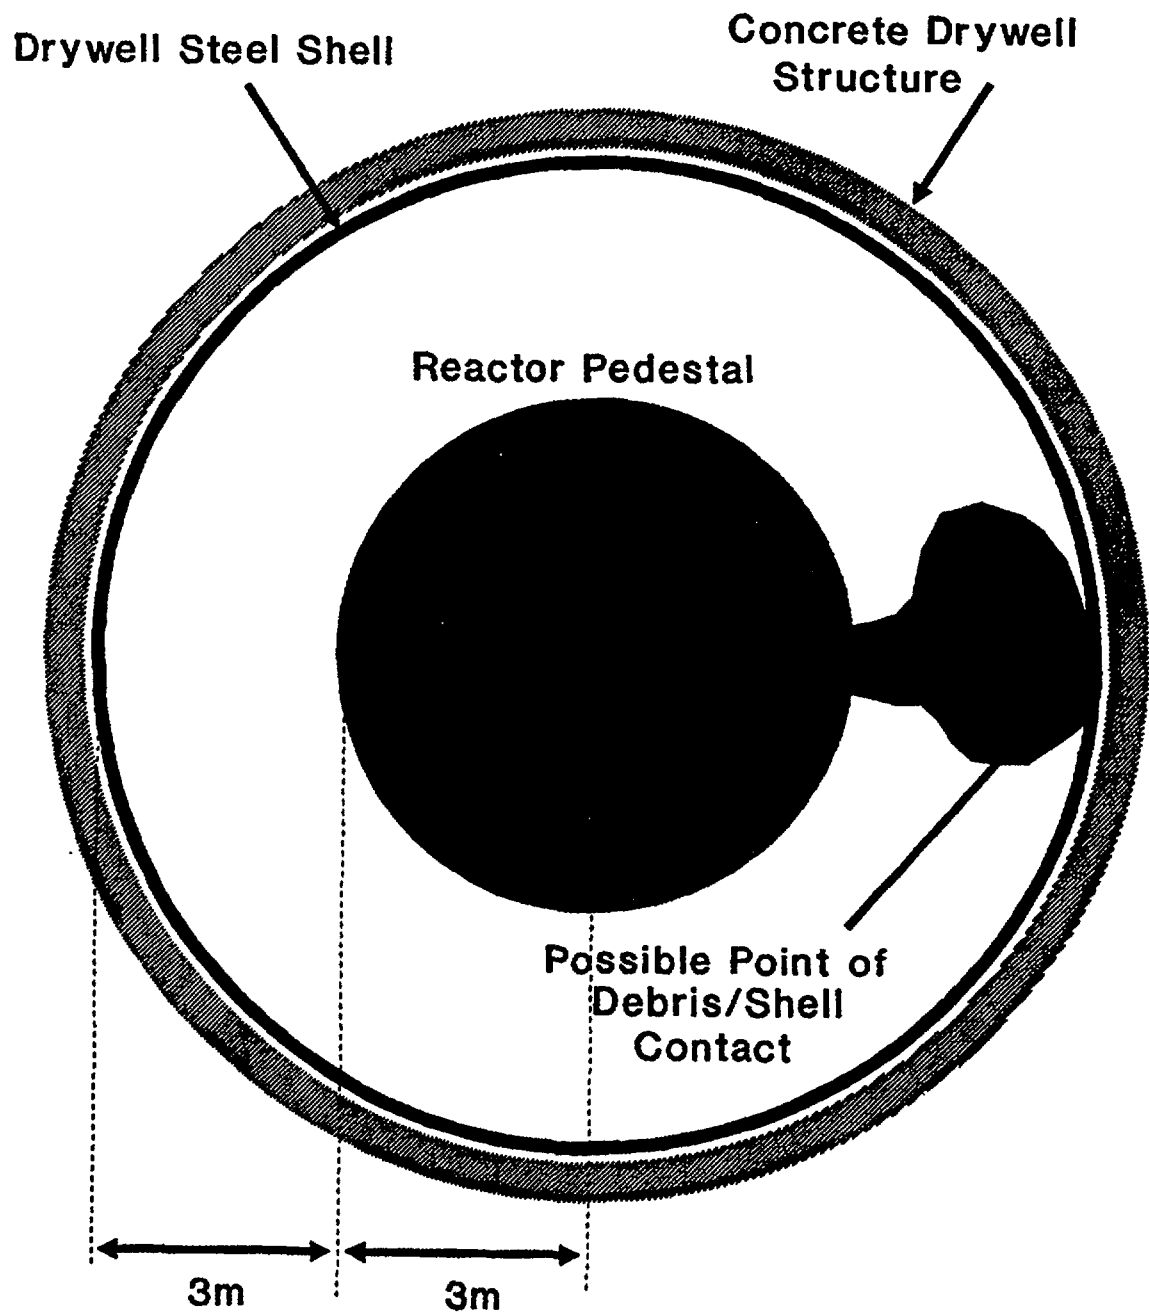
Configuration of Peach Bottom drywell shell/floor—horizontal cross section.
